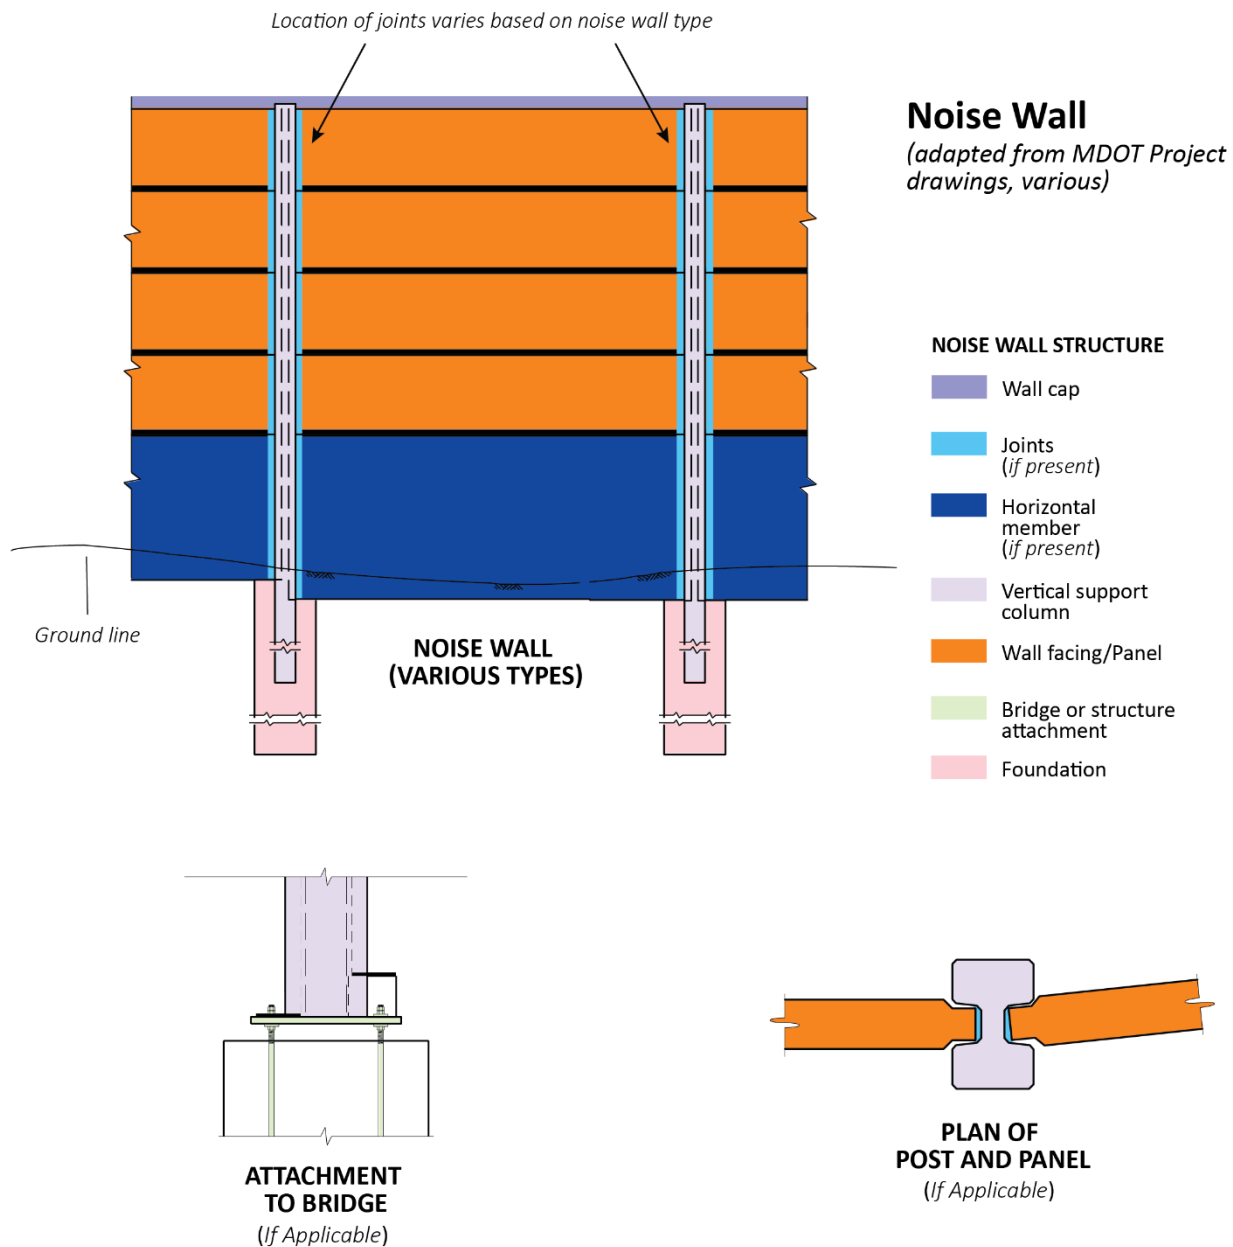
Elements and component for post and panel Noise Wall (adapted from MDOT Project drawings, various)
